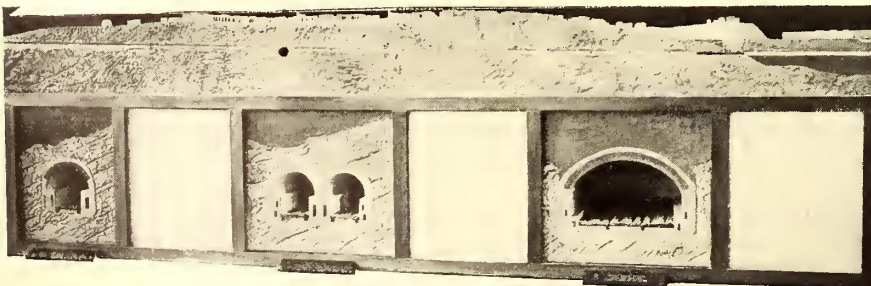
MODELS OF SECTIONS OF TUNNEL
